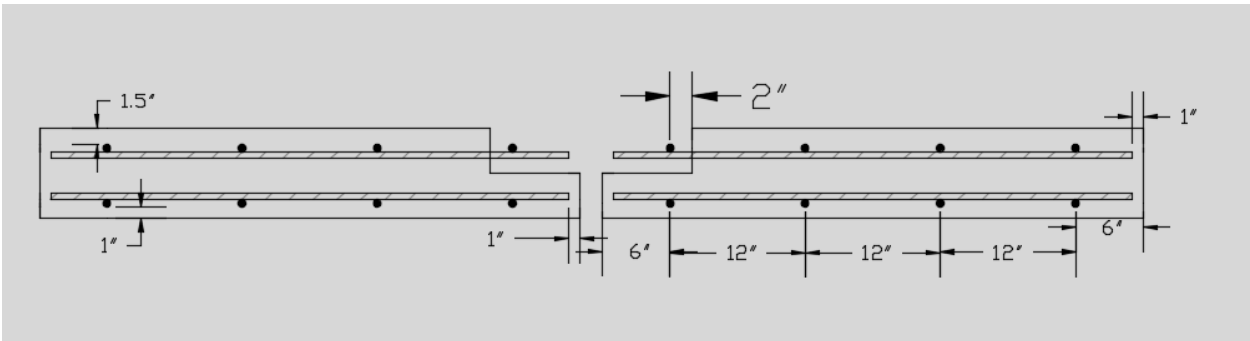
Elevation view of reinforcement excluding splice bar between slab specimens
